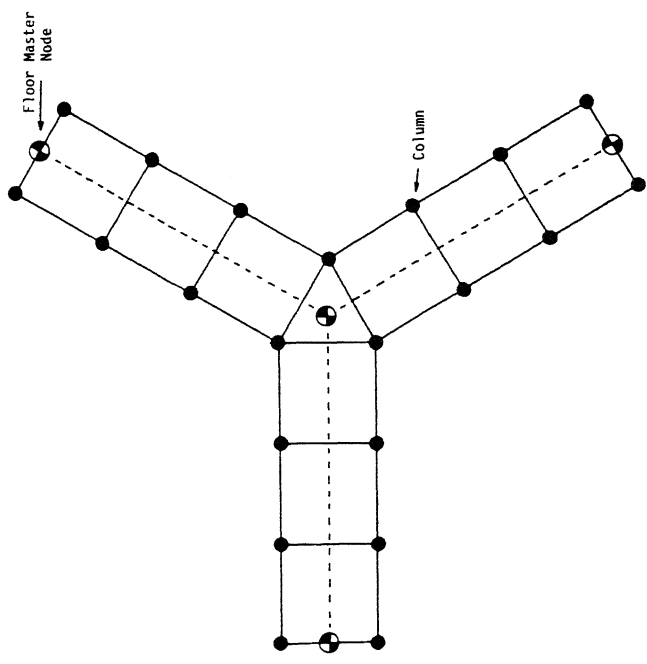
PLAN OF THREE WINGED STRUCTURE
